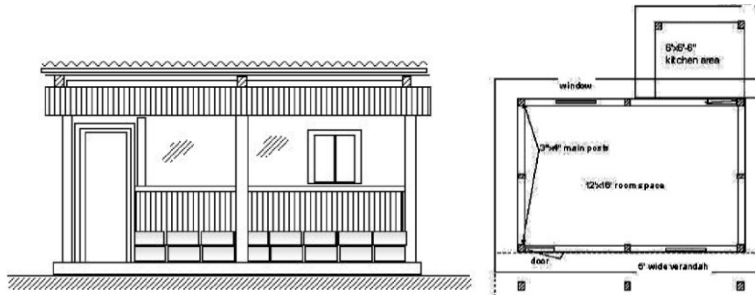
T- shelter front view- A Typical Floor Plan used in the disastrous areas in Sri Lanka (Sandra D'URZO, 2006).
